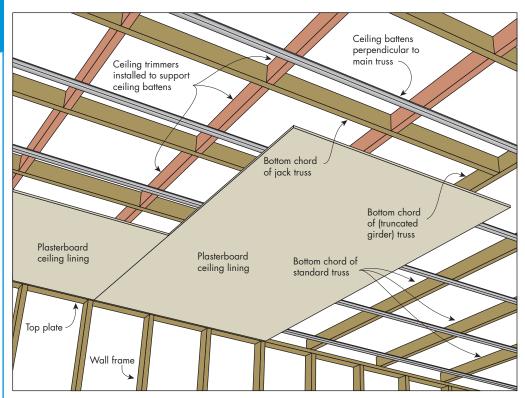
Install Ceiling Trimmers for Ceiling Batten Systems. Install Plasterboard Perpendicular to Ceiling Battens
